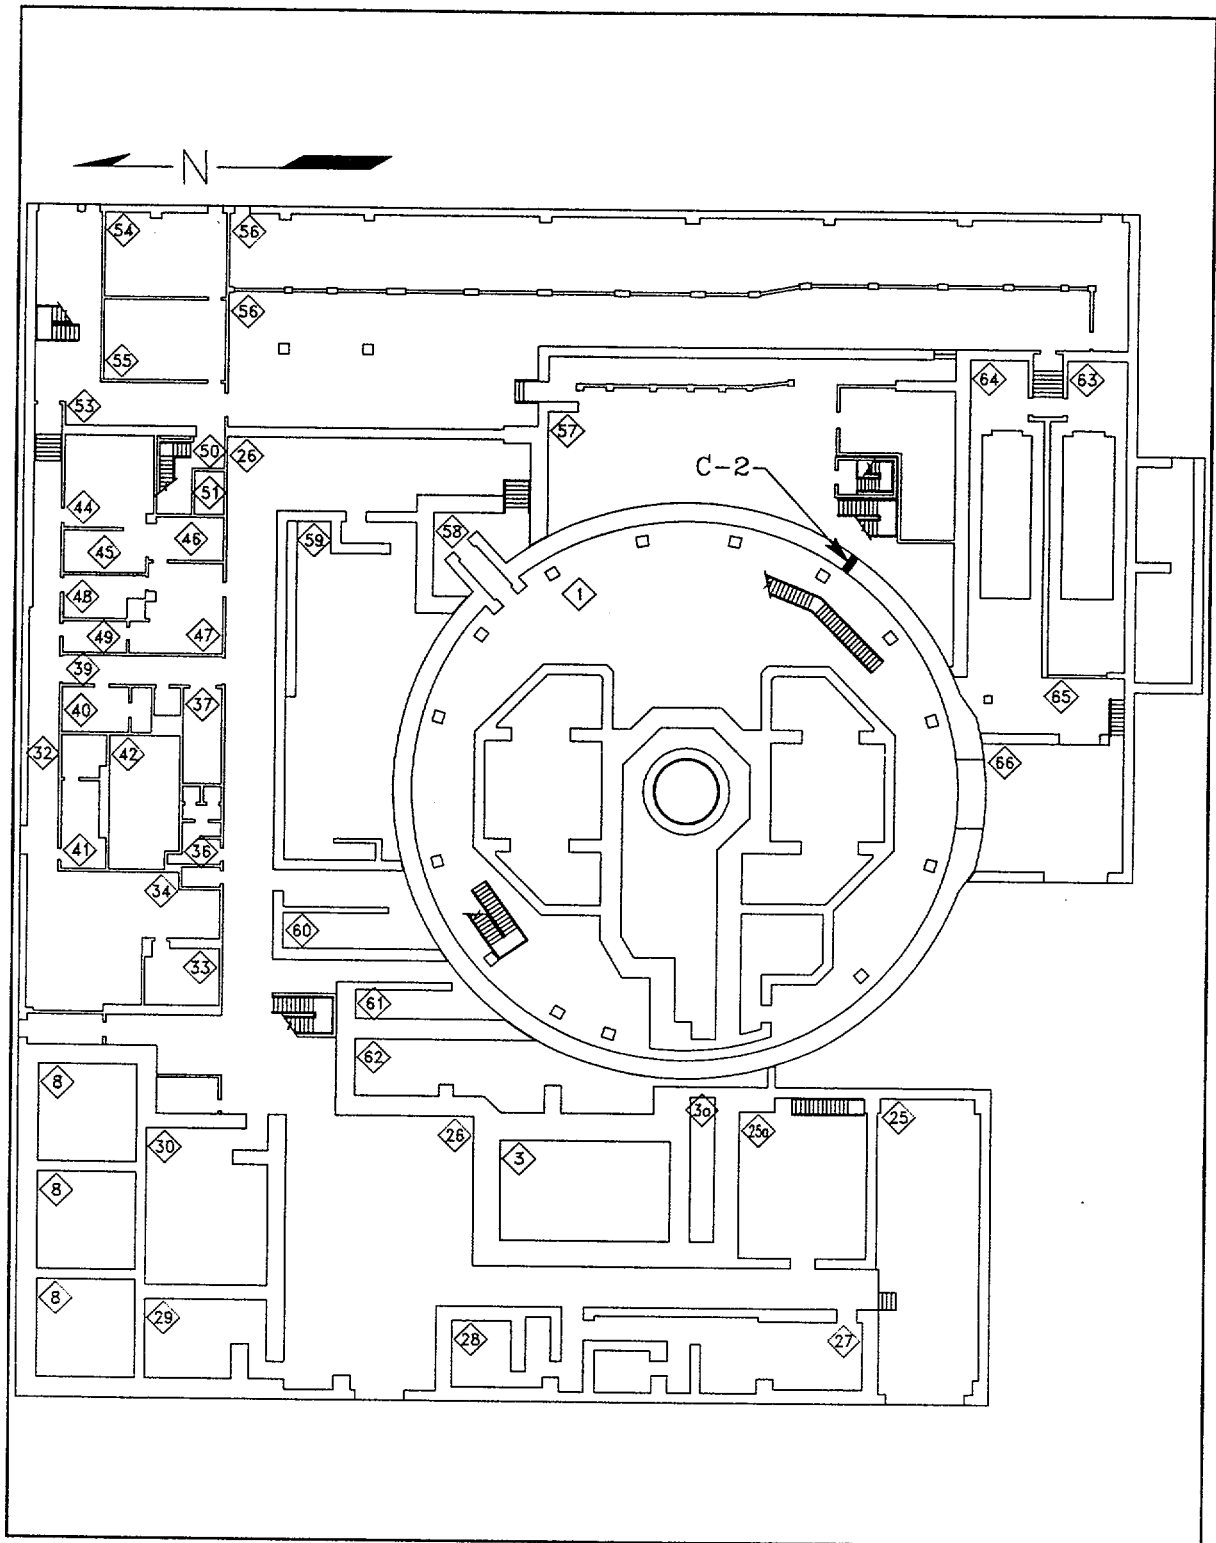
Auxiliary Building - Plant Elevation 1036'-0
